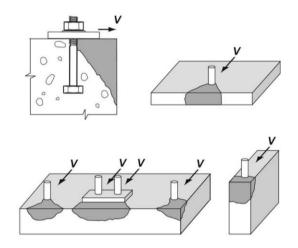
Type of damage in concrete due to shear load at anchorage support.
